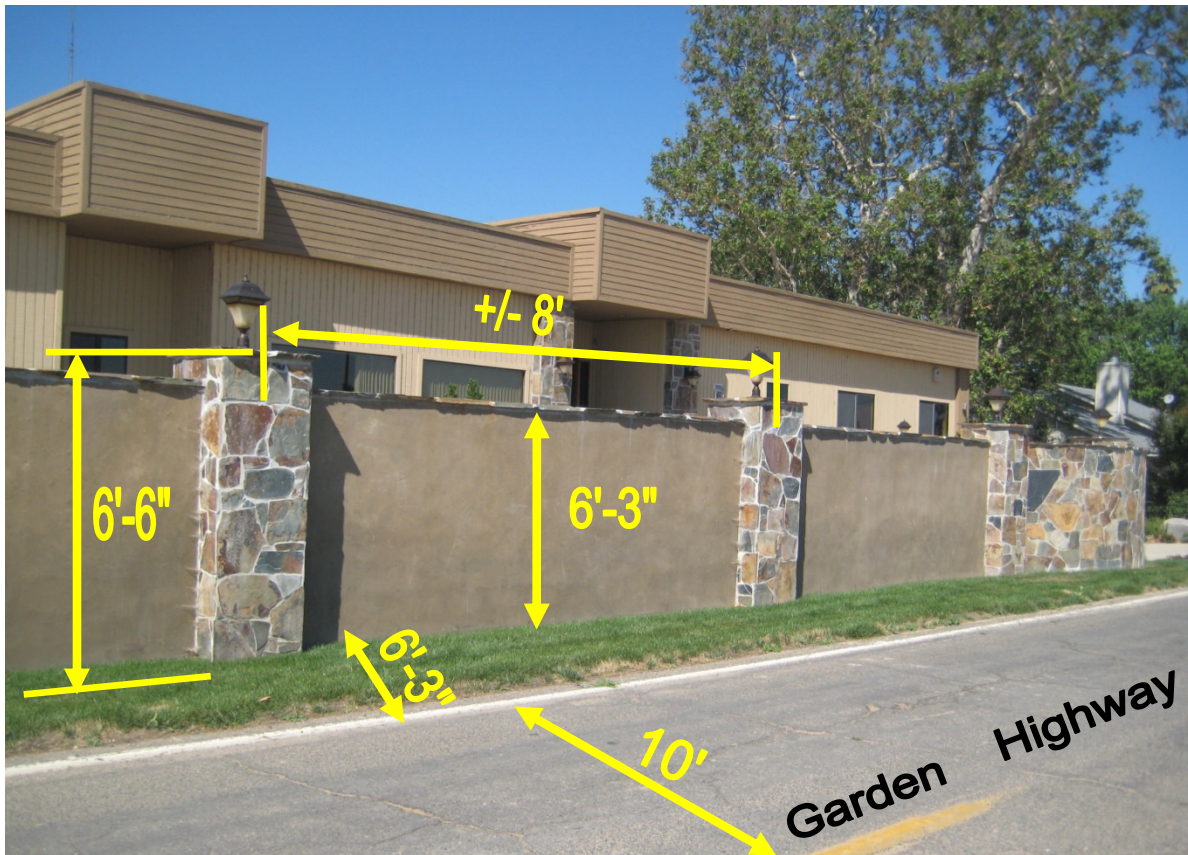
New solid masonry wall. Board staff site visit June 22, 2011
